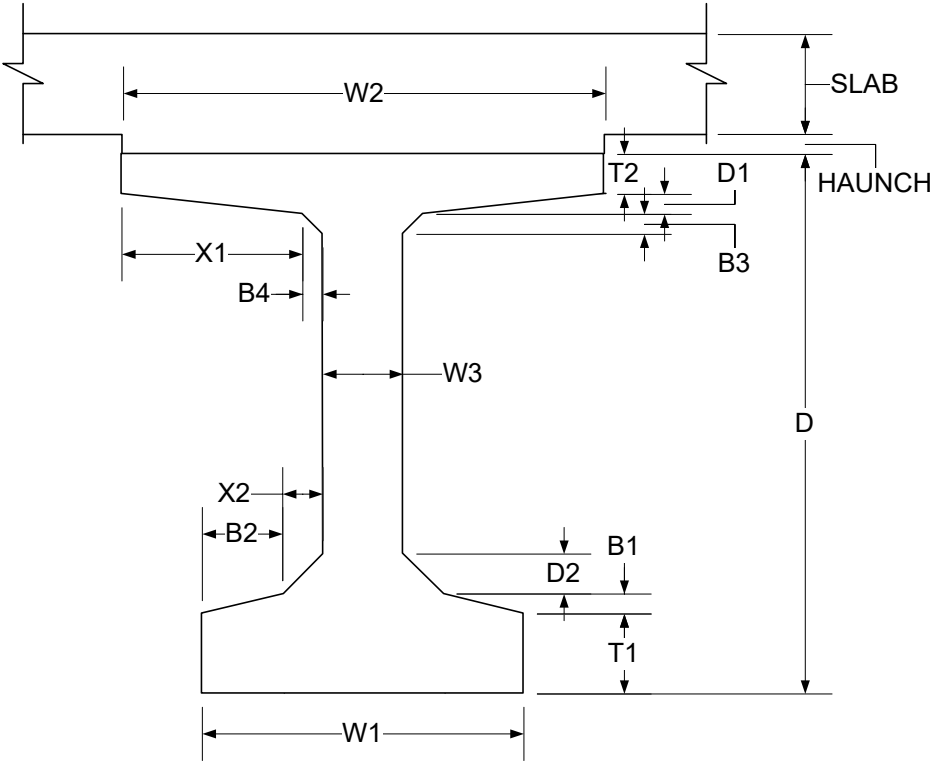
Beam Dimensions – Bulb-tee beams
